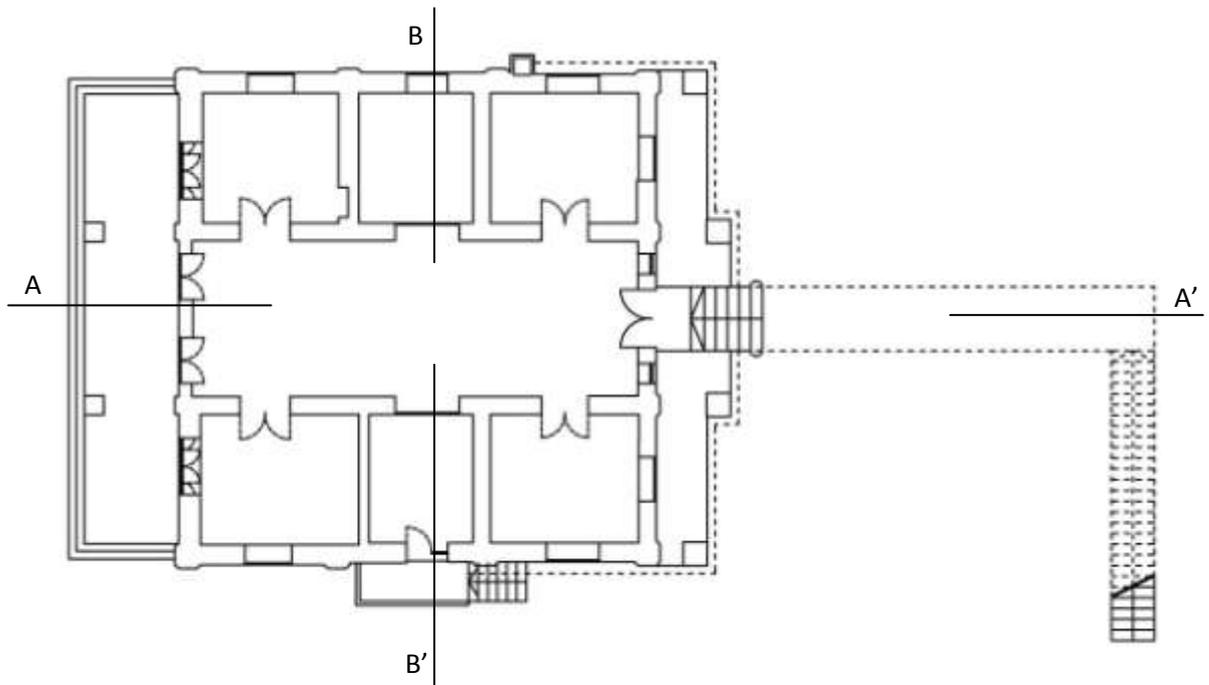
Ground floor of the house at 63 lot 20 parcel
